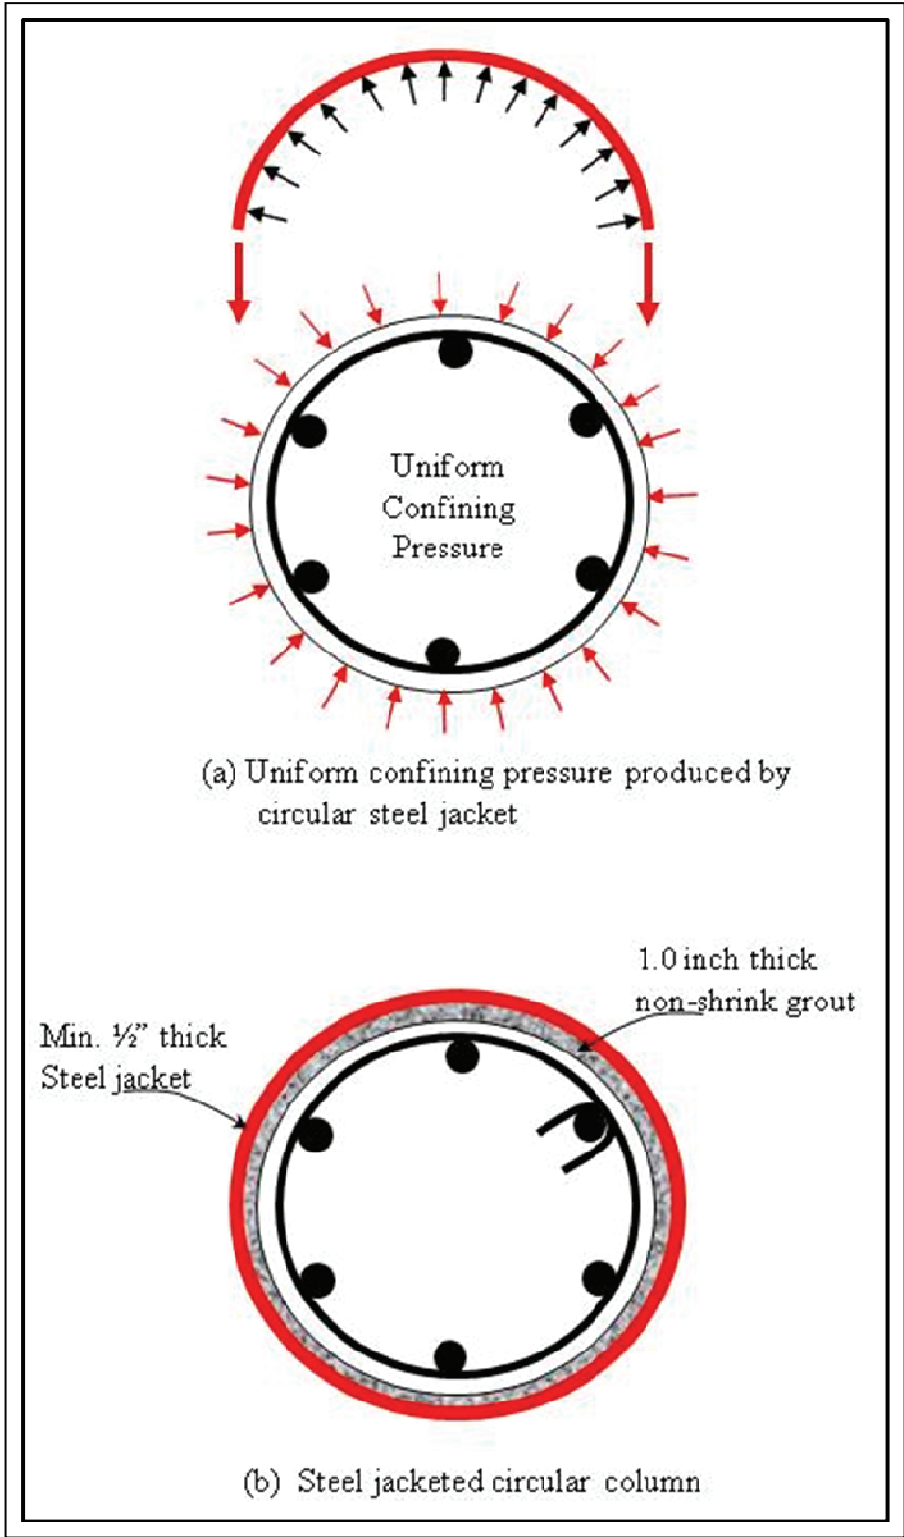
Seismic Retrofit of a Circular Concrete Column with Circular Steel Jacket (Aboutaha, 1996)
